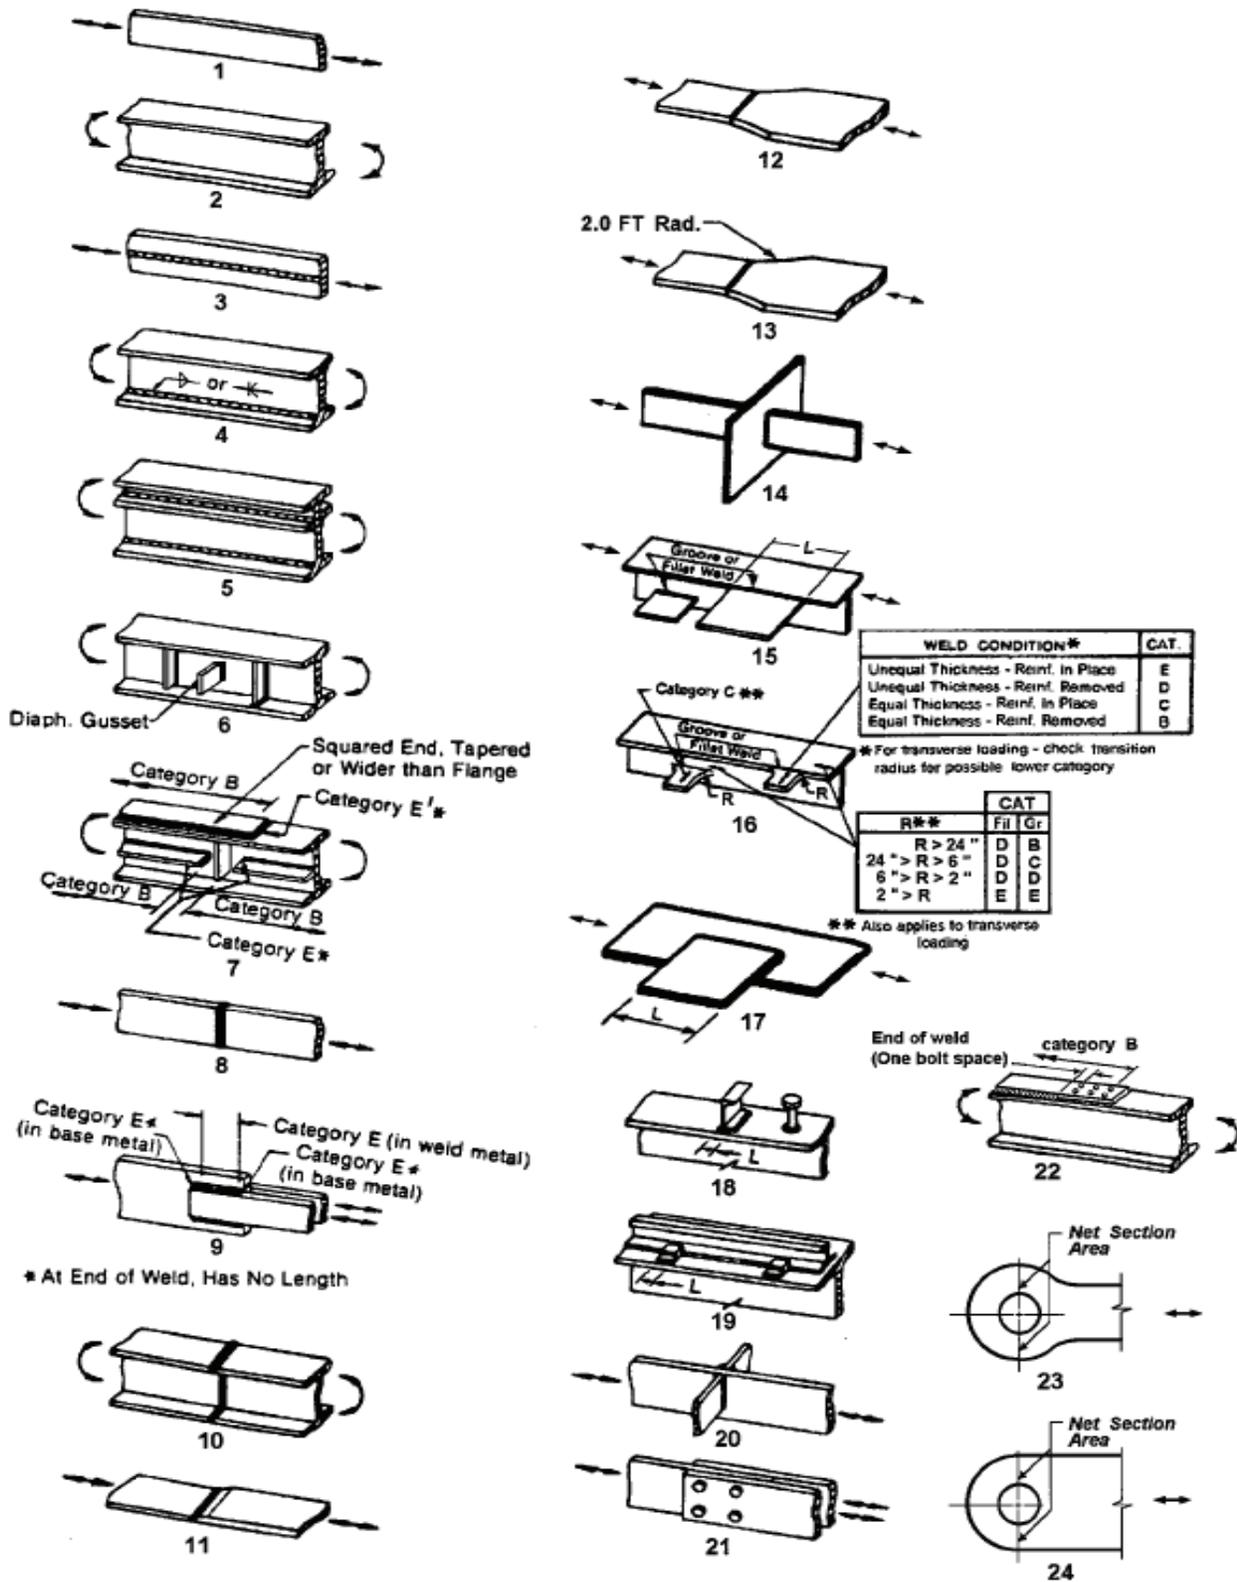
AASHTO LRFD Bridge Design Specifications, 3rd Edition, with 2005 Interim Revisions, Figure 6.6.1.2.3-1 - Illustrative Examples of Bridge Details
